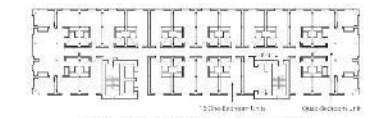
Typical floor plan showing the layout of the building, including the core and tube structure.
